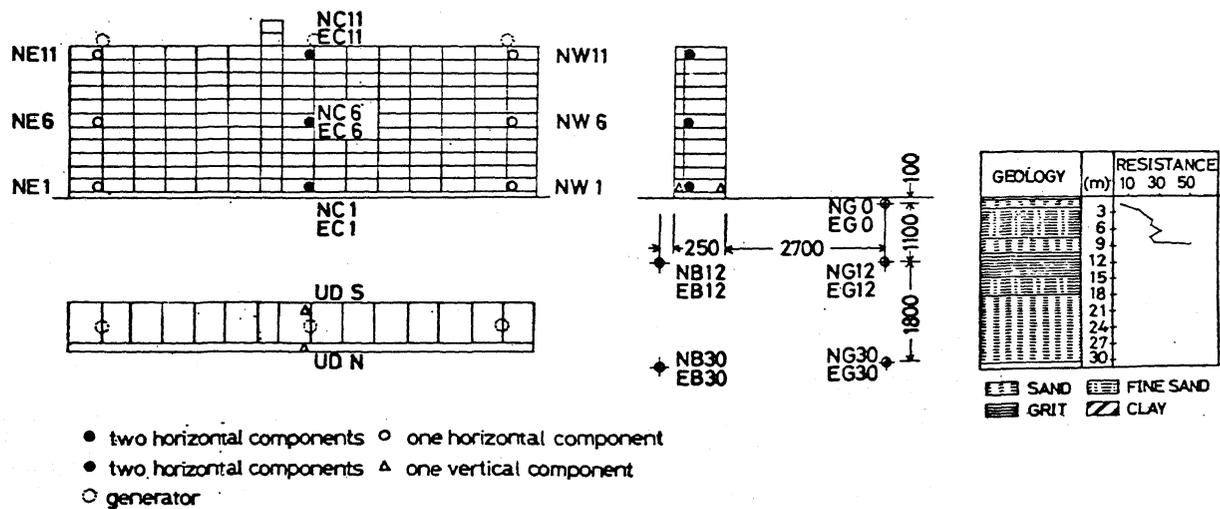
LOCATION OF INSTRUMENTS AND SOIL PROFILE OF BUILDING SITE
